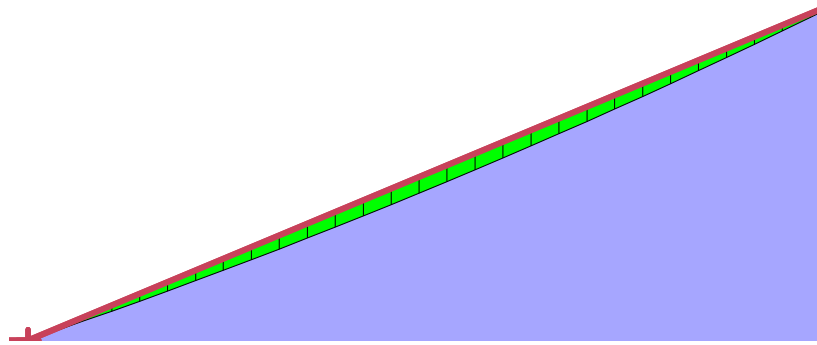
Potential failure surface during End of Construction (Detail C)
